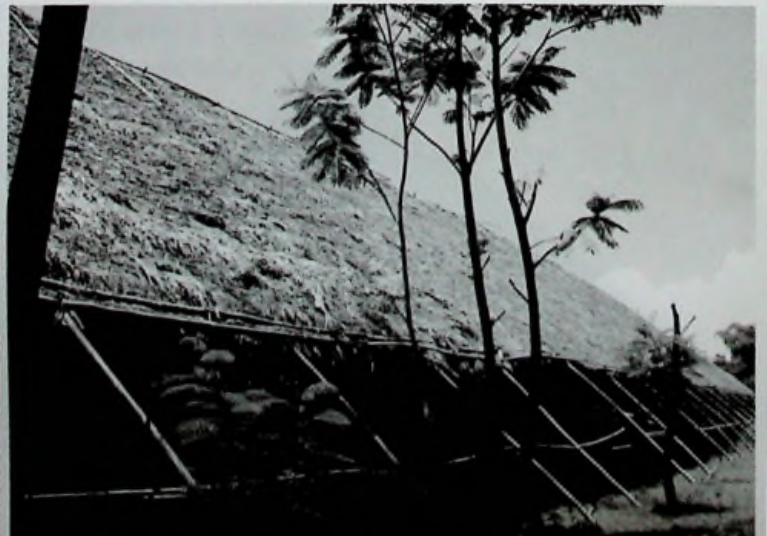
Bamboo roof hindered by hanging tobacco leaves in Klaten's Los.
